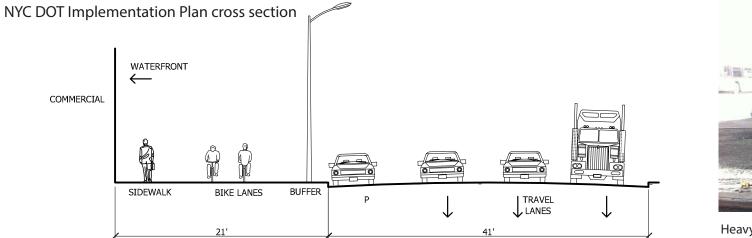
Possible Configuration for Third Avenue between 21st Street and 27th Street
